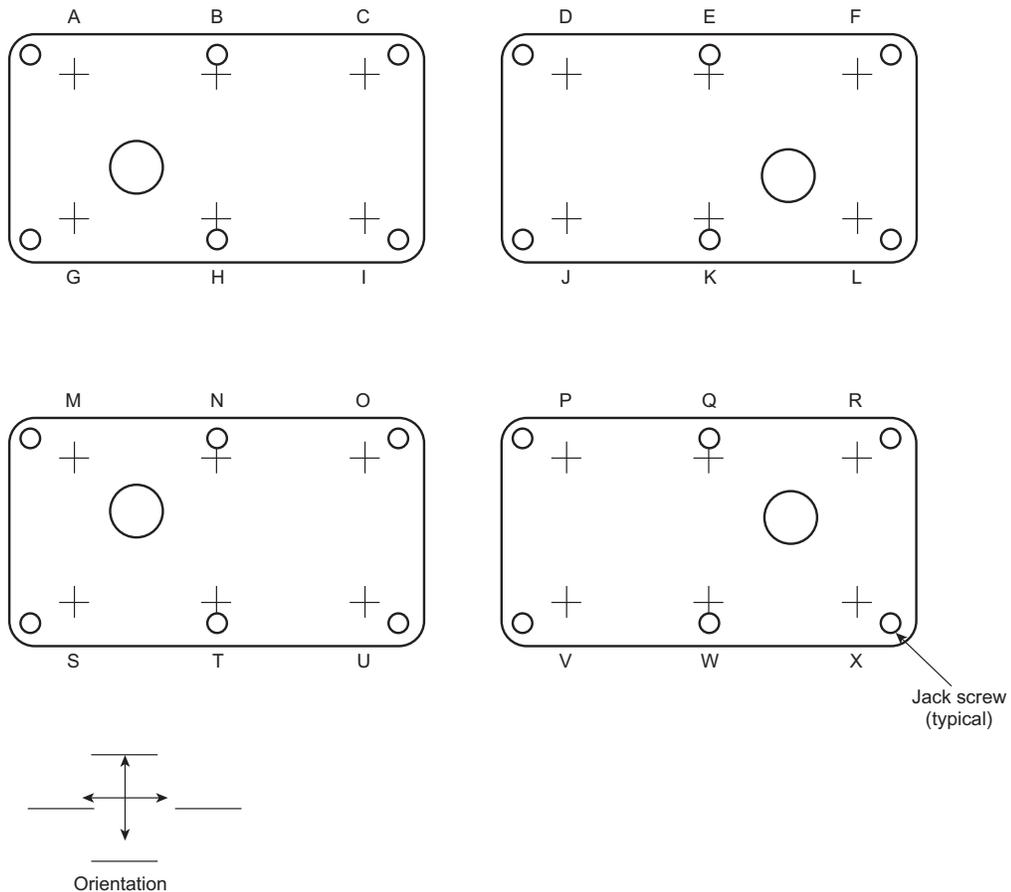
Typical Soleplate Layout for Elevation and Level Measurement
